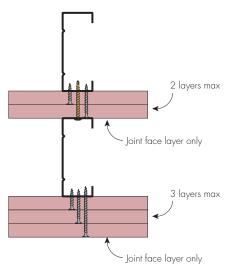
Non-Trafficable Ceiling to Plasterboard Wall
